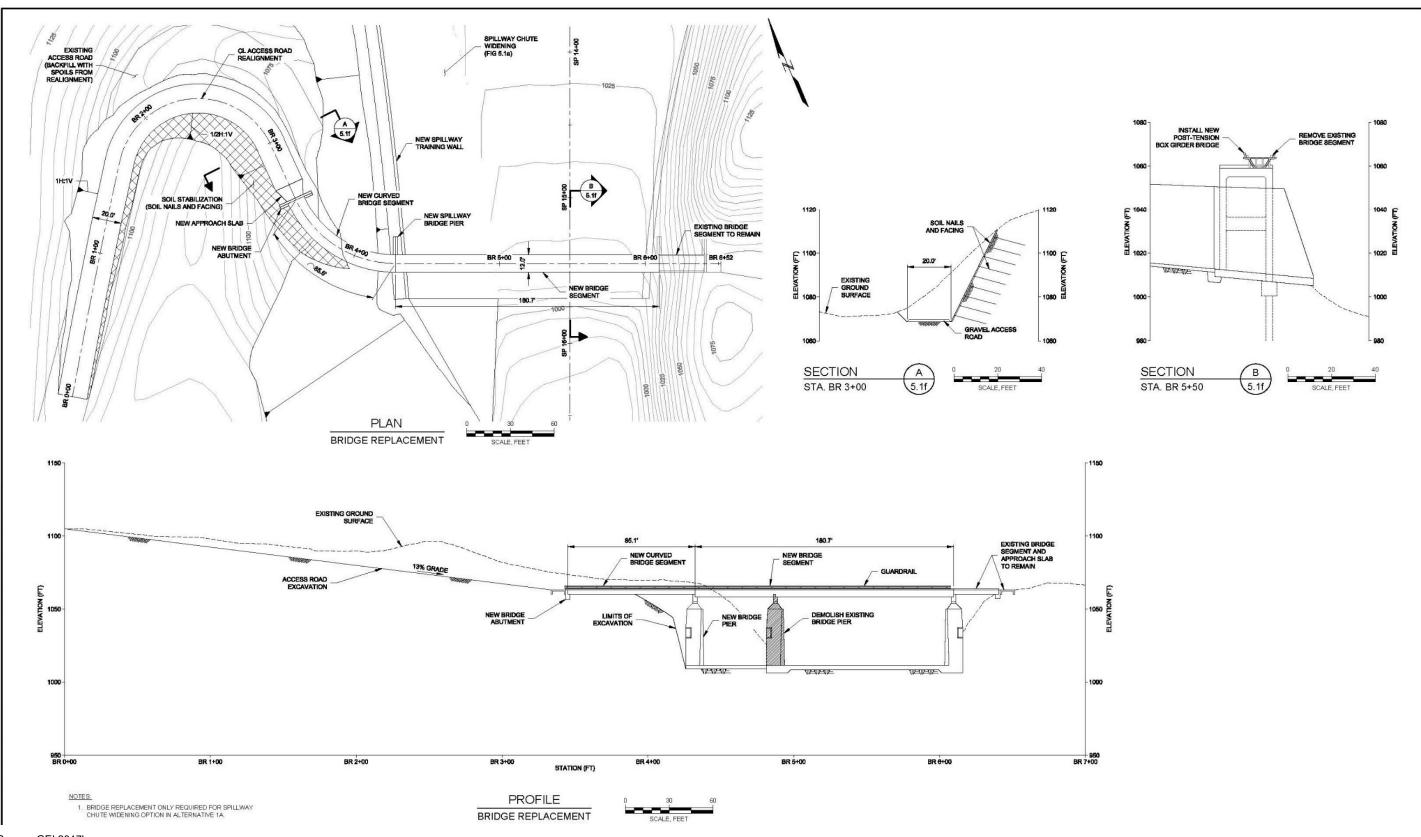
Plan and Profile Views of Bridge Replacement Associated with Spillway Channel Widening Option
